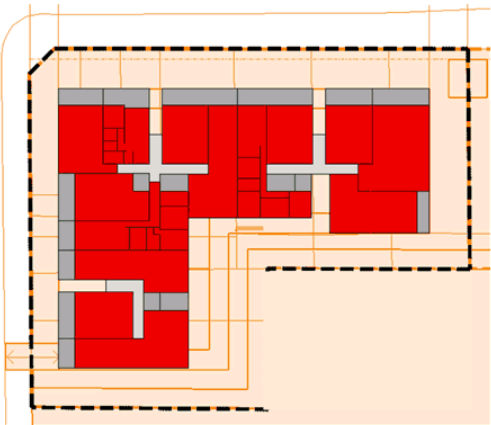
INDICATIVE APARTMENT LAYOUT
